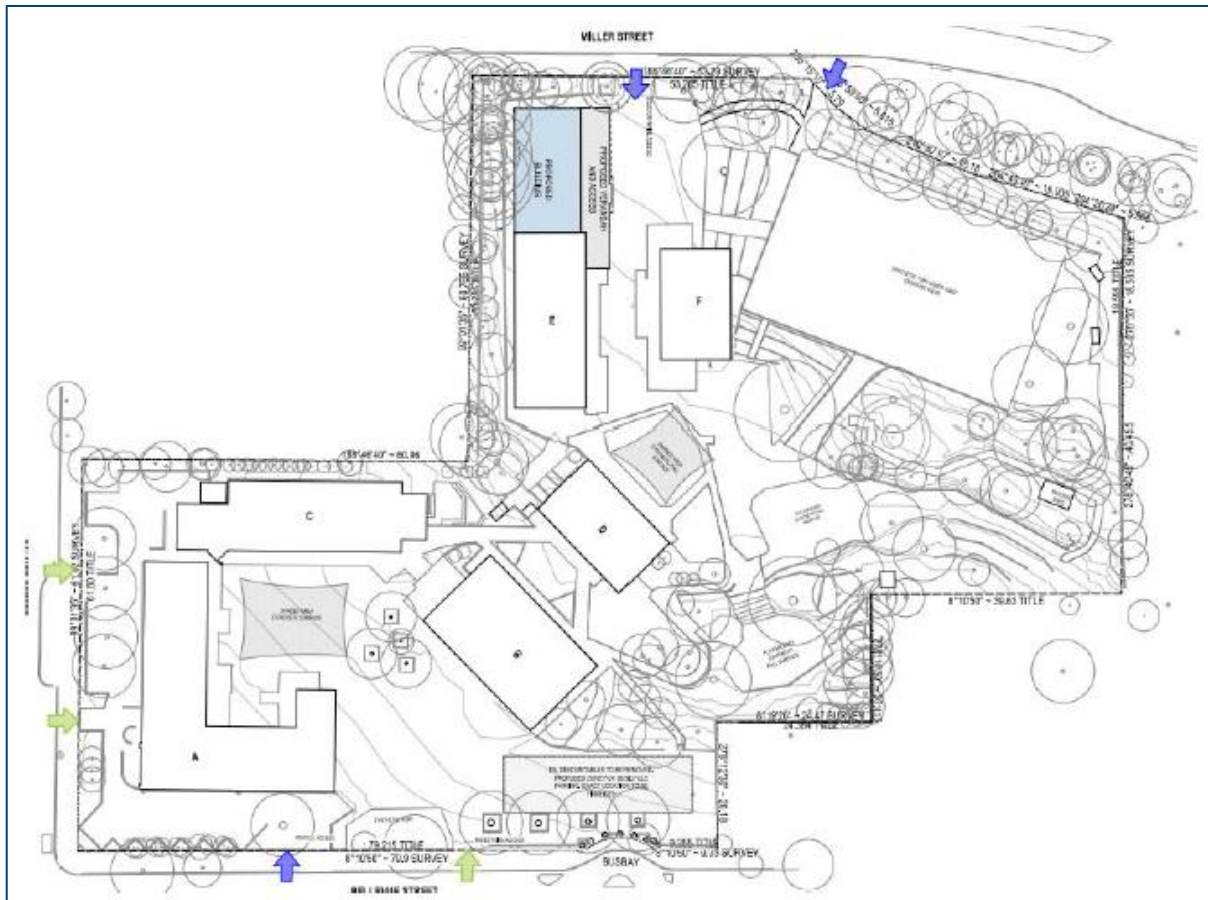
Proposed Scope of Works (Source: Fulton Trotter Architects, Proposed Site Plan (Rev P5))
